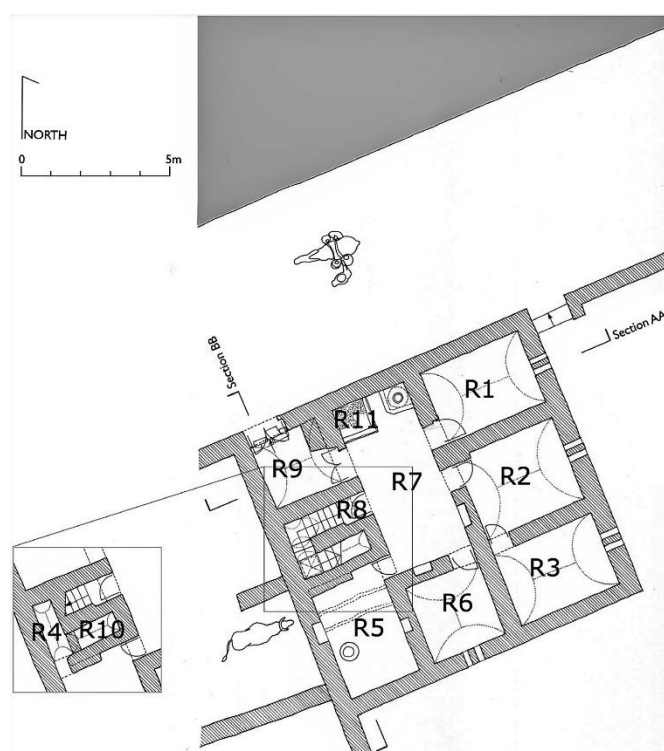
Plan of House B2 at Amheida (Boozer 2014: 103, figure 6.2).
